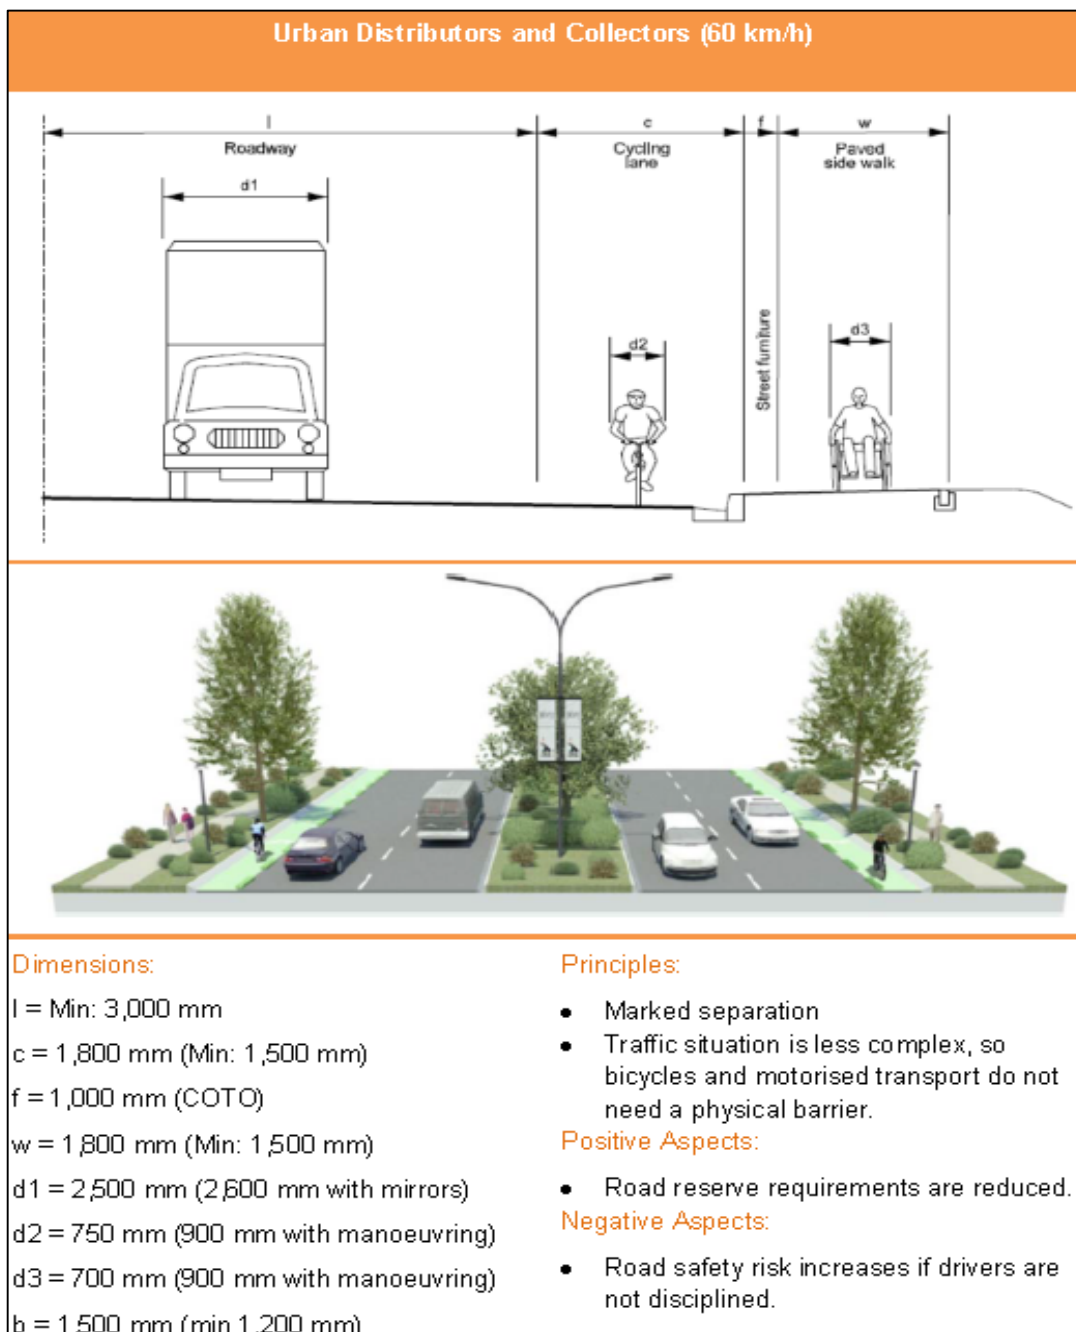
NMT typical cross-section - Typical road cross-section (NDoT, 2014).
